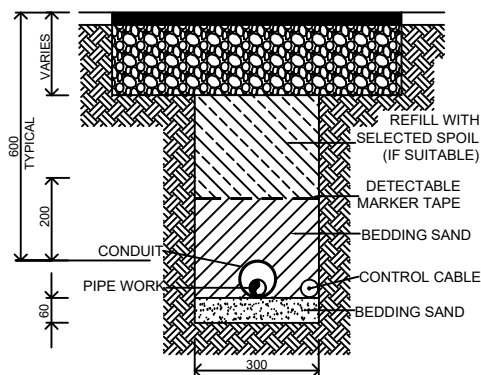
TYPICAL MAINLINE OR SUBMAIN TRENCH
